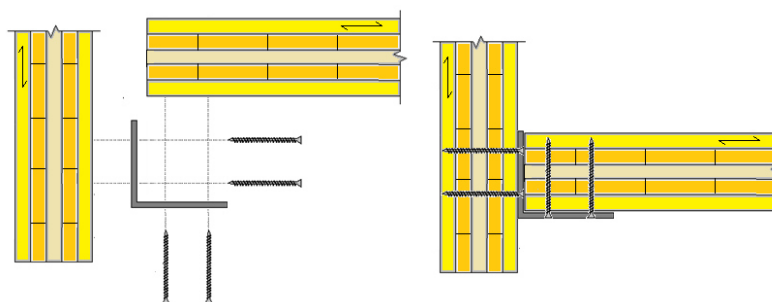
Angle bracket solution for wall-to-wall intersection or wall-to-floor connections.
